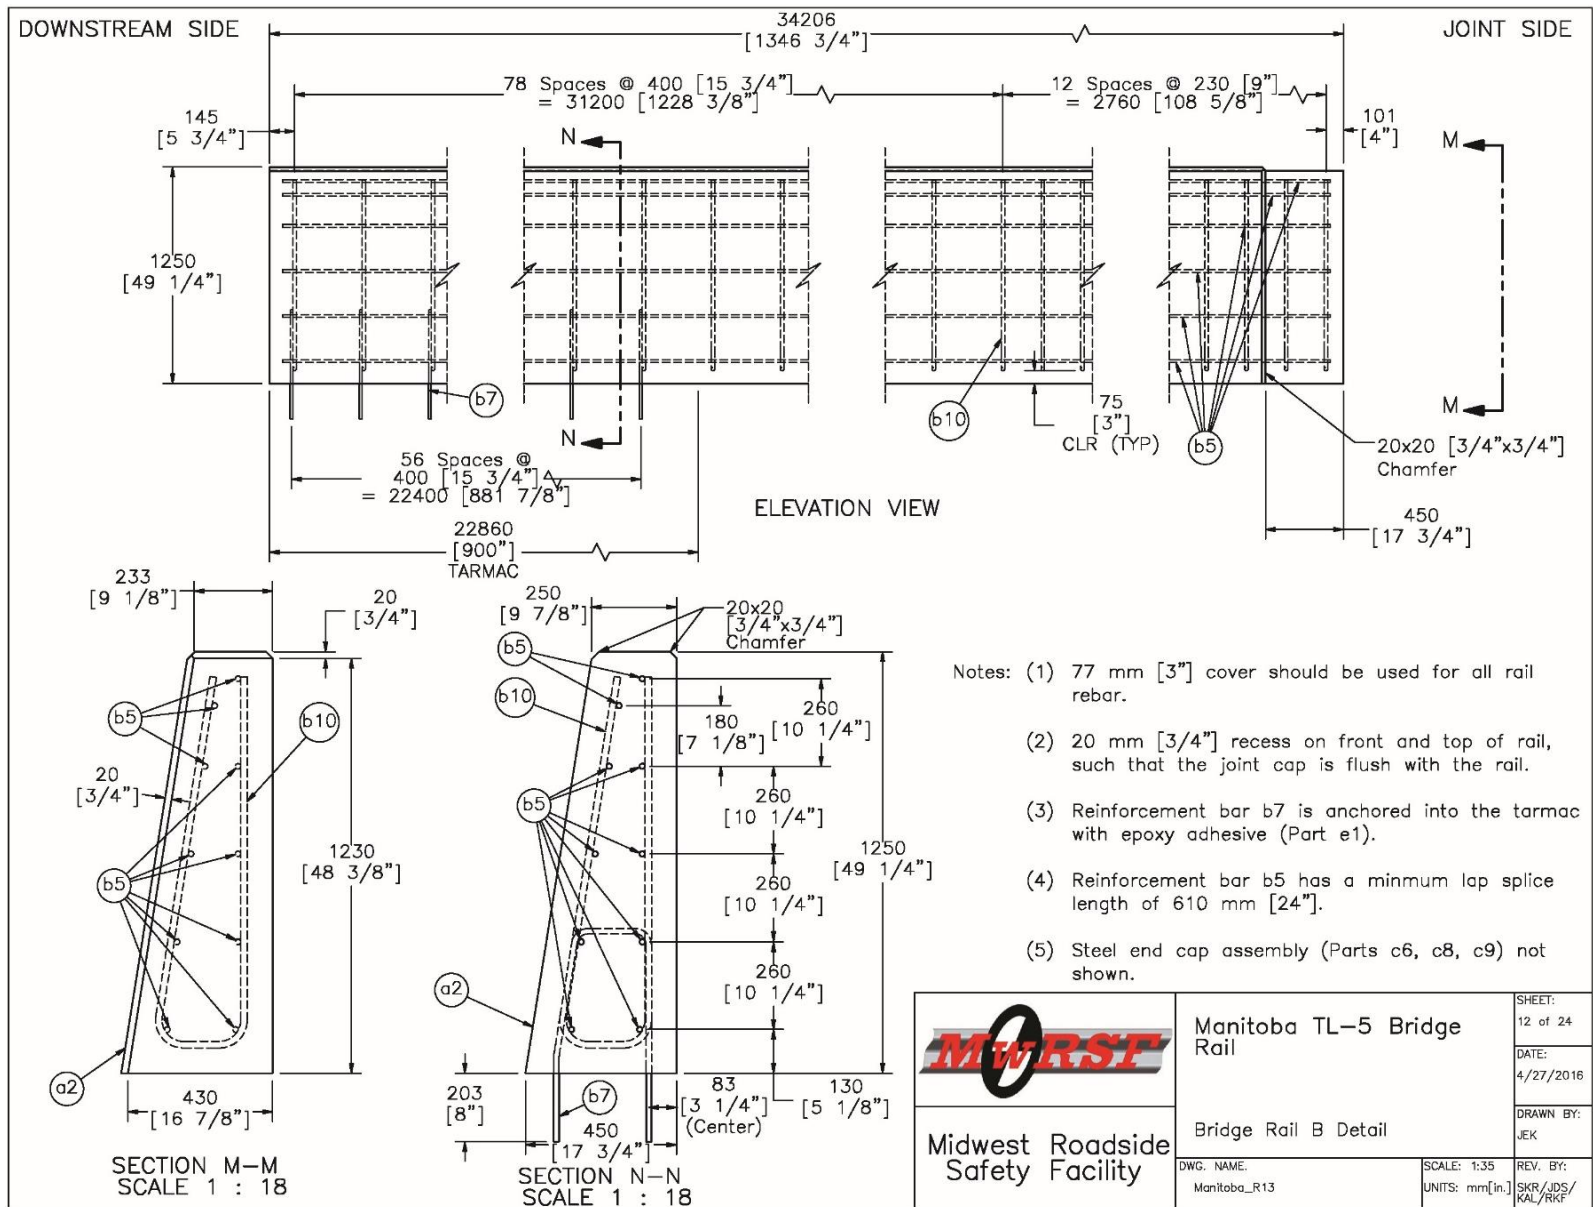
Bridge Rail B Detail, Test No. MAN-1
